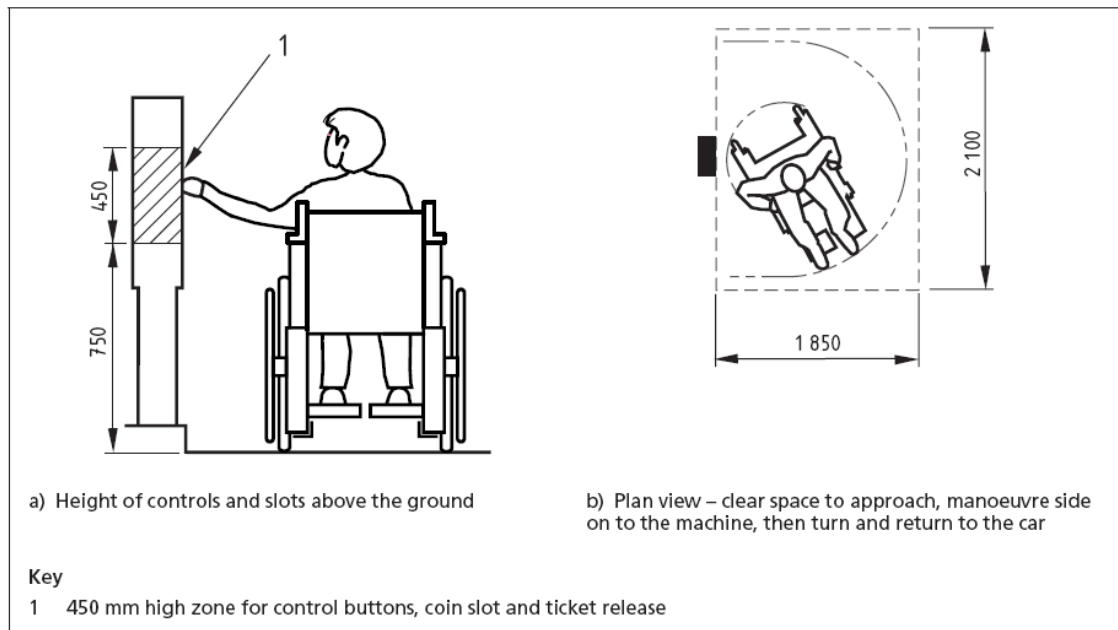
Key Dimensions Relating to Ticket Dispensing Machines for use by Wheelchair Users (dimensions in millimetres)
